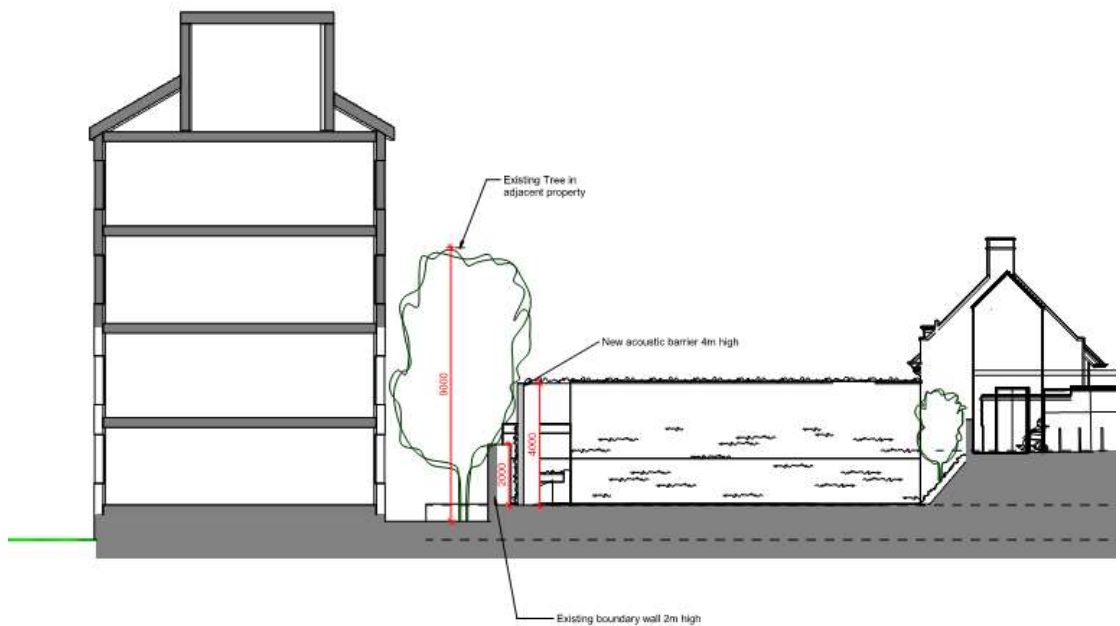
section showing acoustic barrier, proposed playground and rear of Downshire Hill properties (application drawings)
